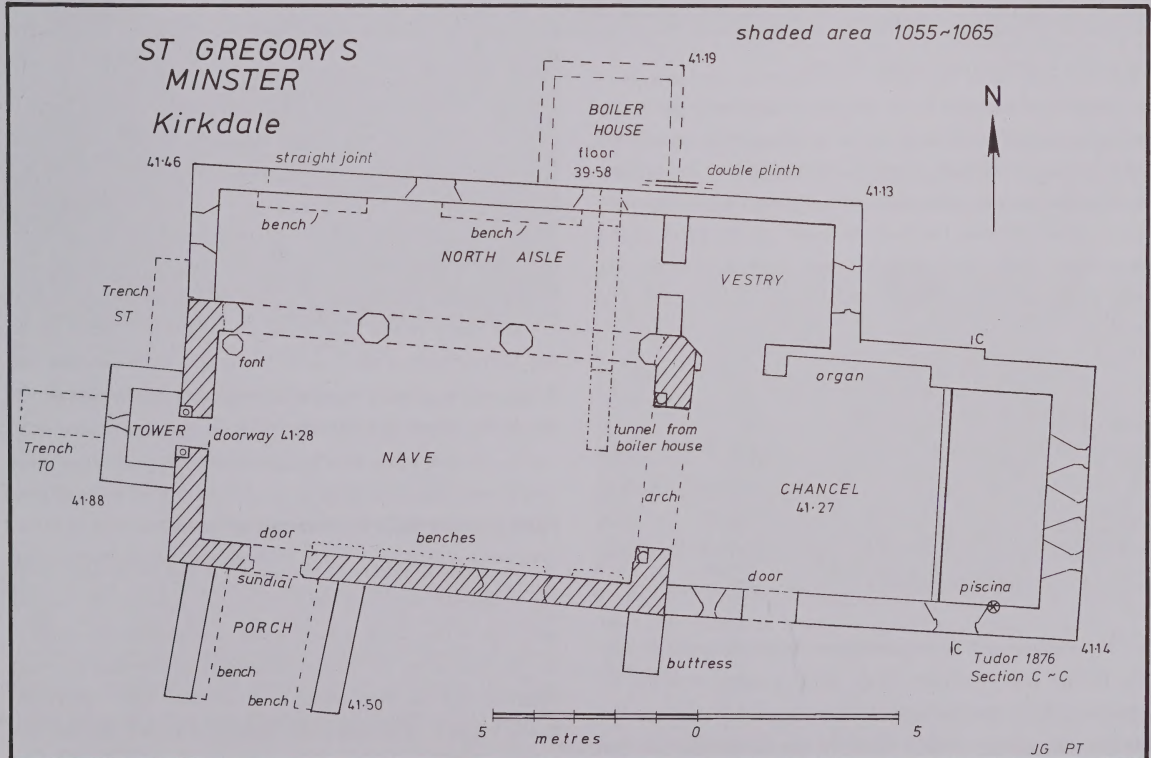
St. Gregory's Minster; Plan showing location of Trenches TO and ST, and other features.
